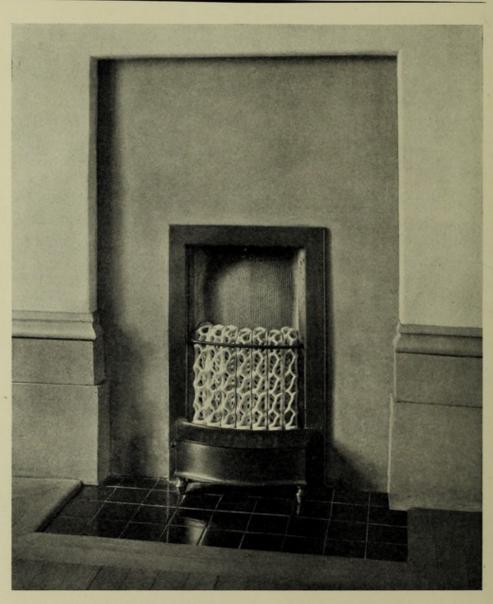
At No. 4 Bentinck Terrace, Regent's Park. Gas fire with painted asbestos backing. Architect: Cyril Farey, F.R.I.B.A.
